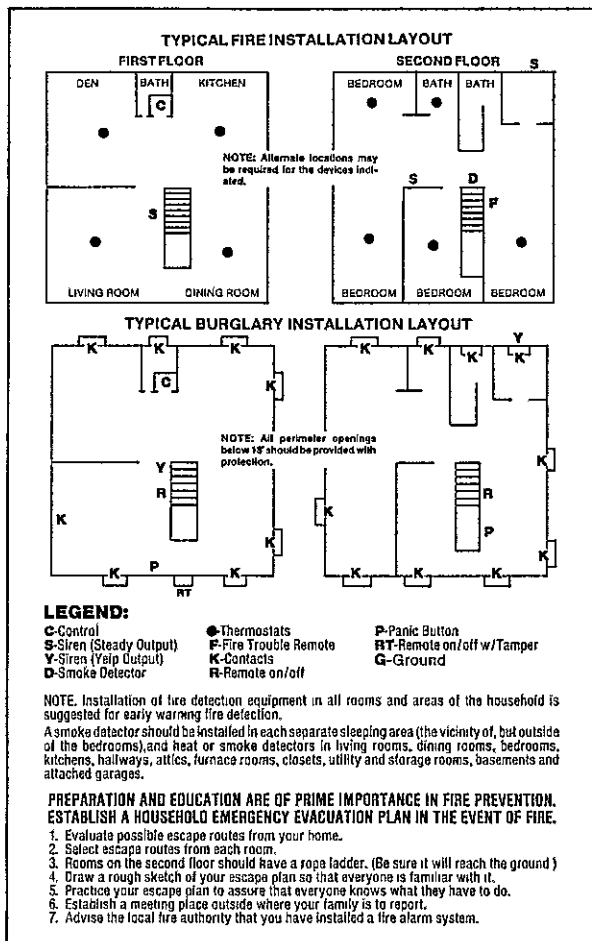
TYPICAL INSTALLATION LAYOUTS
